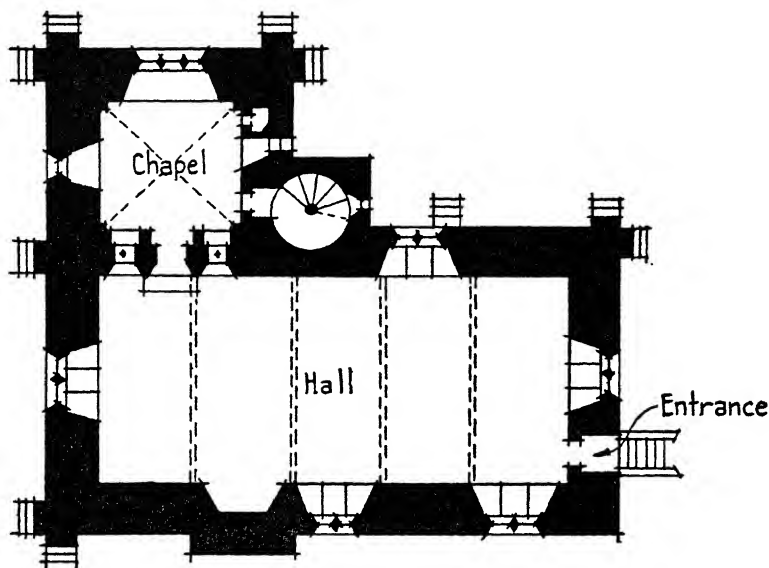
PLAN, LITTLE WENHAM HALL, SUFFOLK
